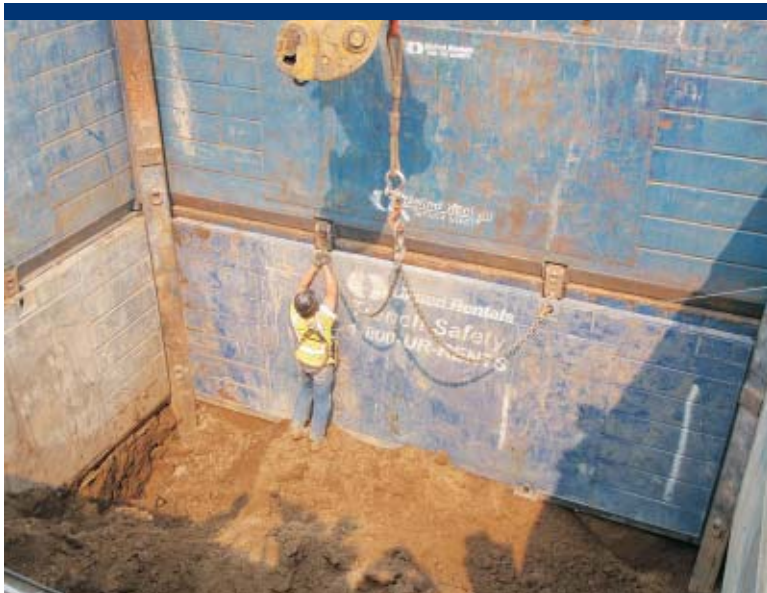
ERRS worker in safety harness assembles temporary sheet pile wall supports.
